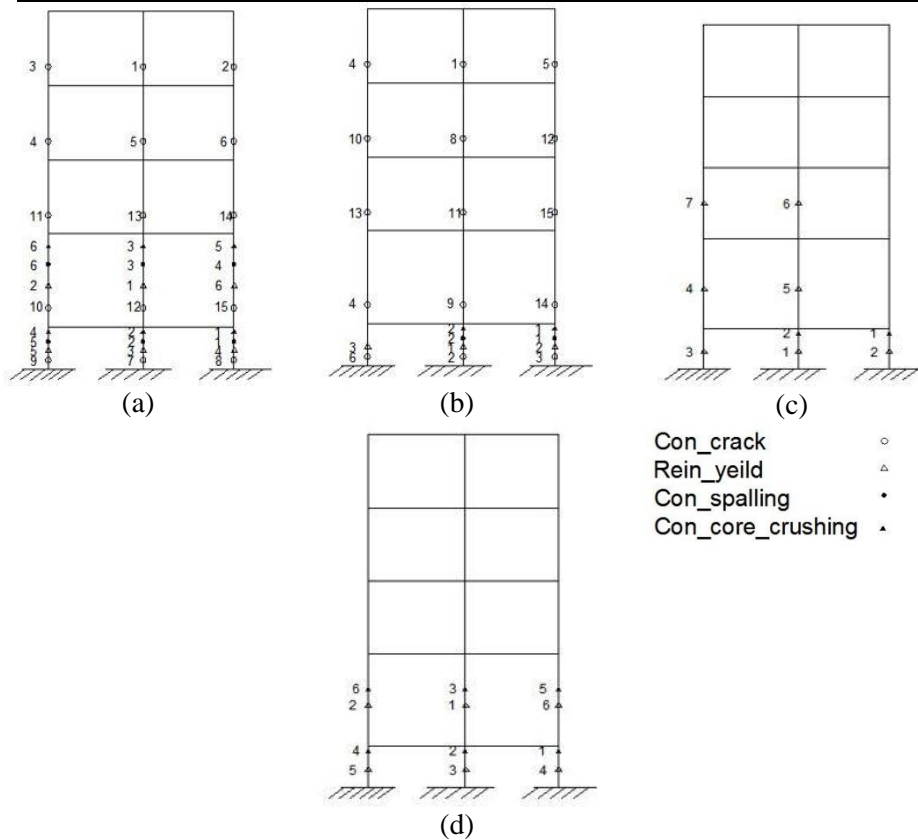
Damage state of the building frame for (a) Original Frame, (b) RC jacketed frame, (c) CFRP jacketed frame and (d) GFRP jacketed frame.
